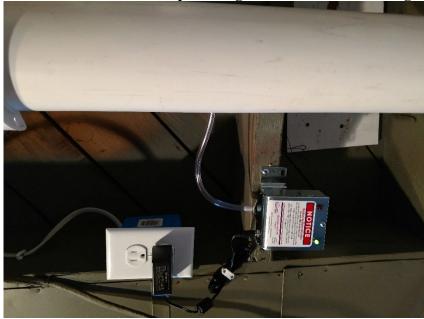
An audible vacuum alarm was installed on the main horizontal run.
